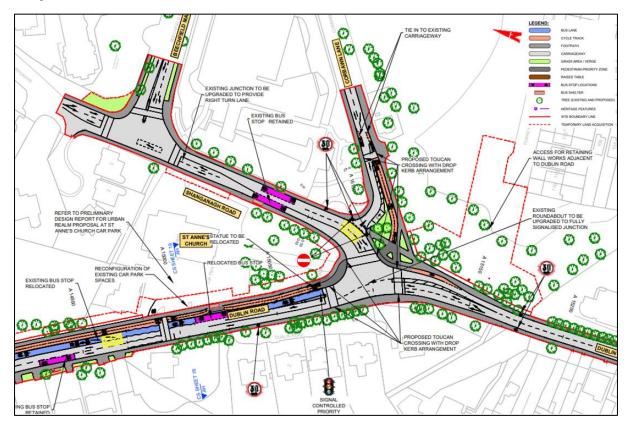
Extract from General Arrangement Drawing at St Anne's Church on Dublin Road (Sheet 43)
